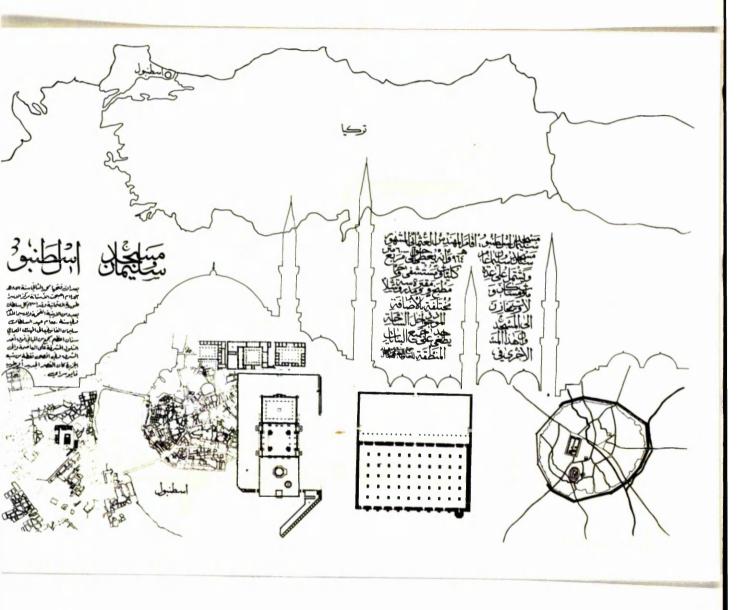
Istanbul, Suleymaniye Complex, Ground Plan and Silhouette.
